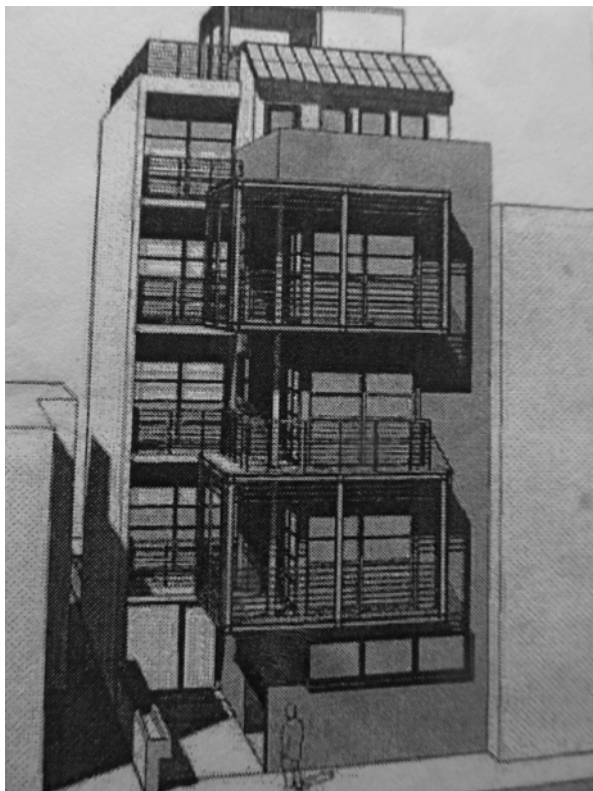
Roof top gardens and solar installation. Location: Battery Park City, Manhattan (Source: The Green Building Handbook (2010). New York City Economic Development Corporation)
